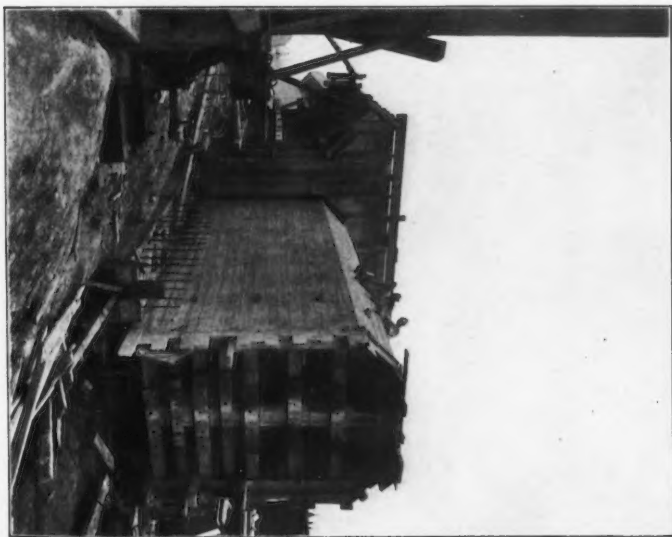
FORMS FOR CONCRETE APPROACH TO OVERHEAD TRAC BRIDGE.
